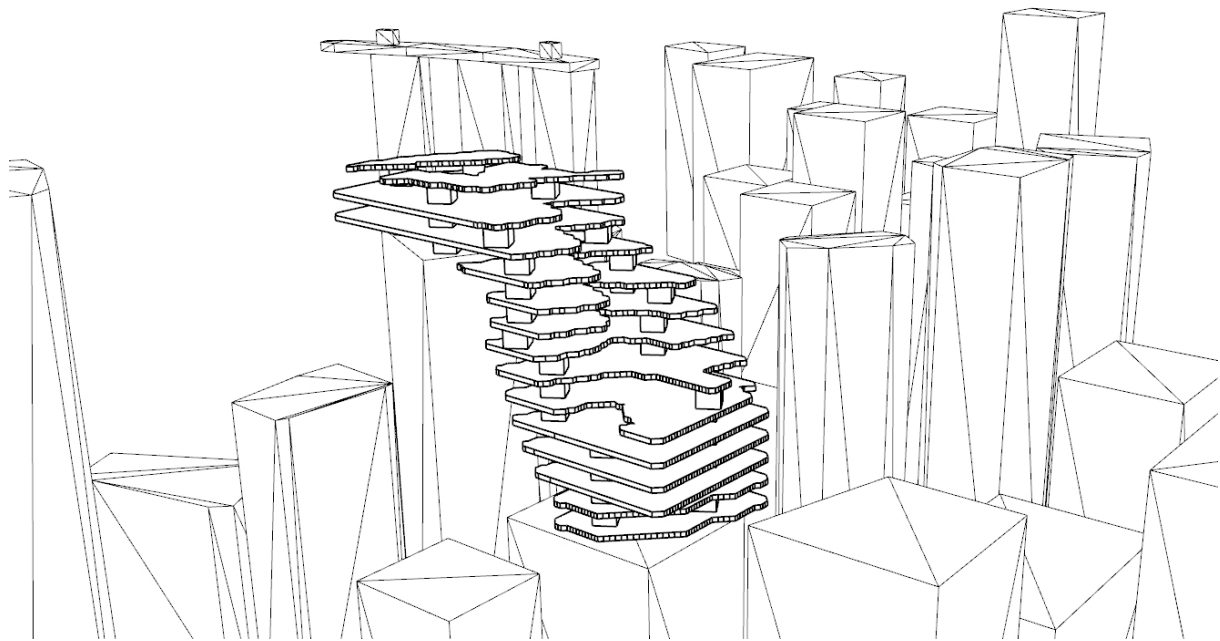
Superstructure with an elevated park connecting the two buildings (Image: T. Senoh, M. Leidi).
